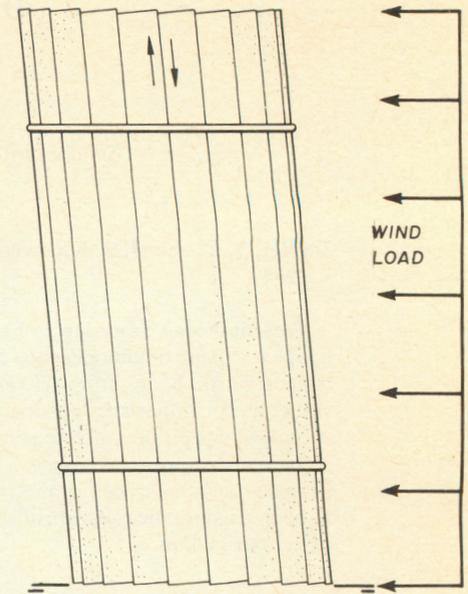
Shear failure in vertical joints of a stave tower silo due to wind loading.
